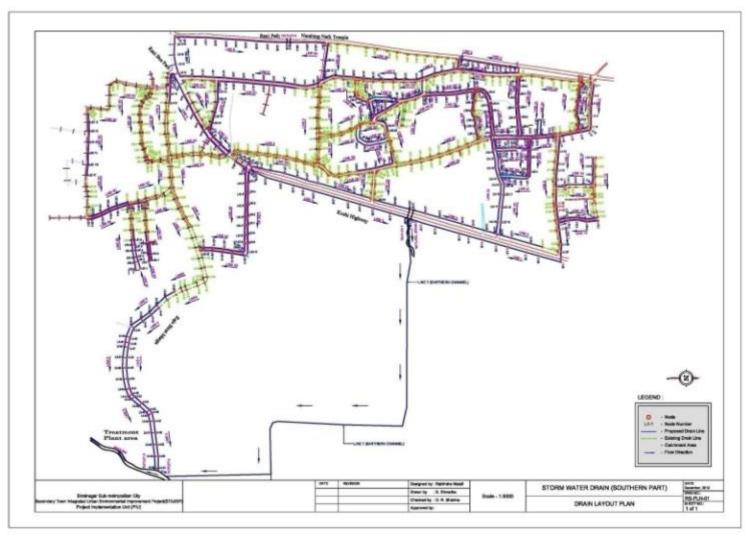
Proposed Storm Water Drains in BSMC (Southern Drainage System)
